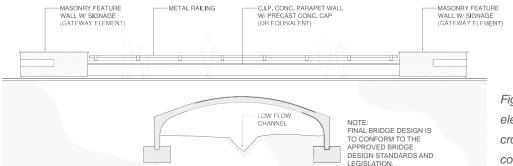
Conceptual elevation option of bridge crossing treatment option for collector roads.
